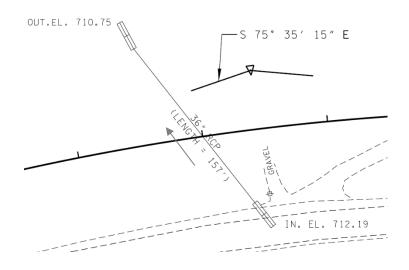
A-6B Example of Pipe Culvert as Shown on Present Layout
